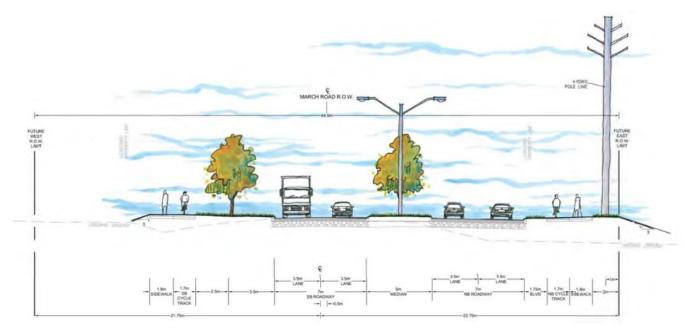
Cross-section of interim plan for March Road from Kanata North CDP
